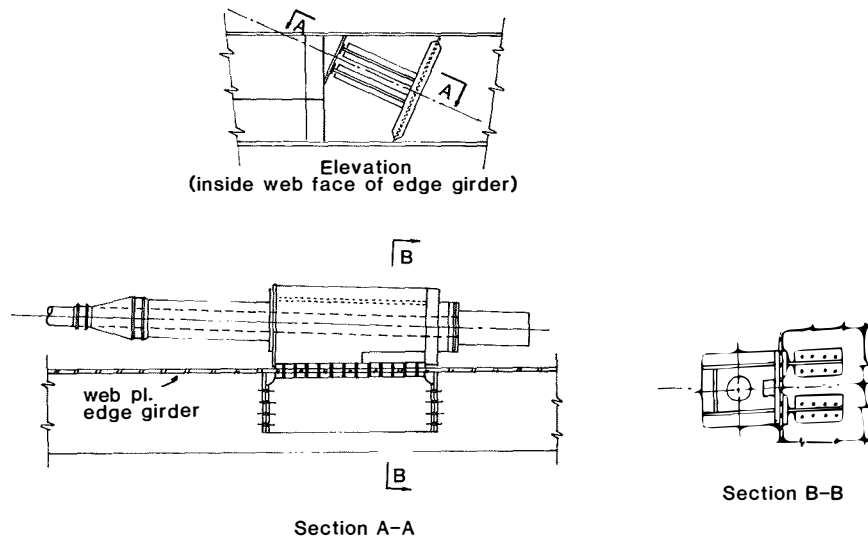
James River Bridge, cable-stay attachment to edge girder.
